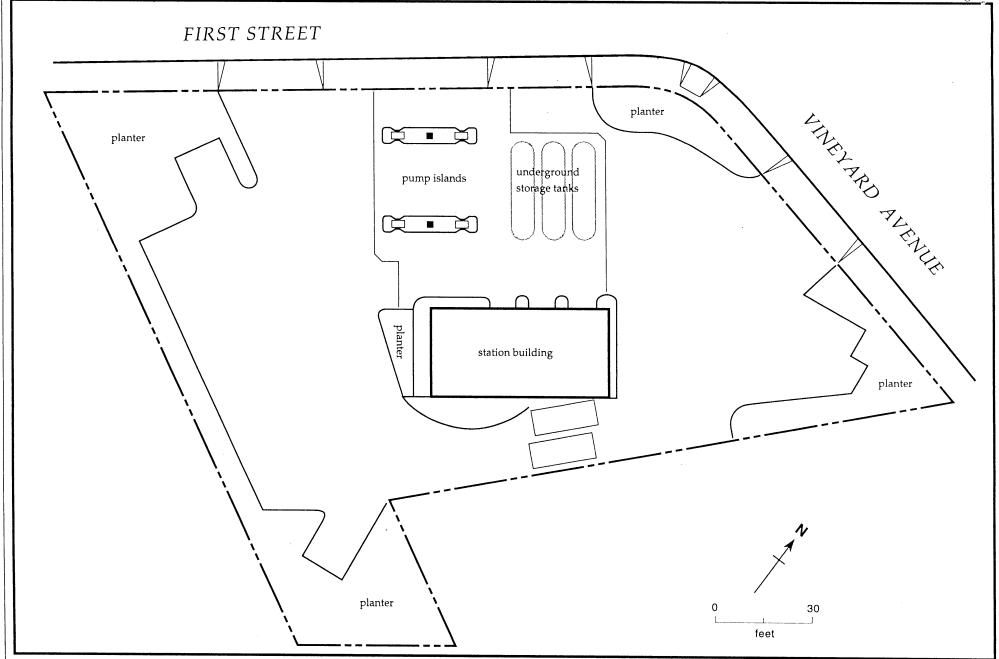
Site Layout - Shell Service Station WIC #204-6138-0303 - 4226 First Street, Pleasanton, California
